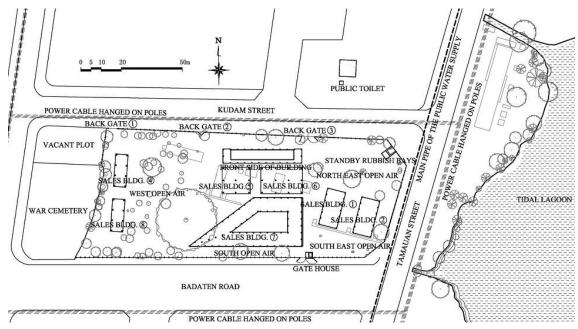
Layout of Retail Sales Sections in the Madang Town Market
